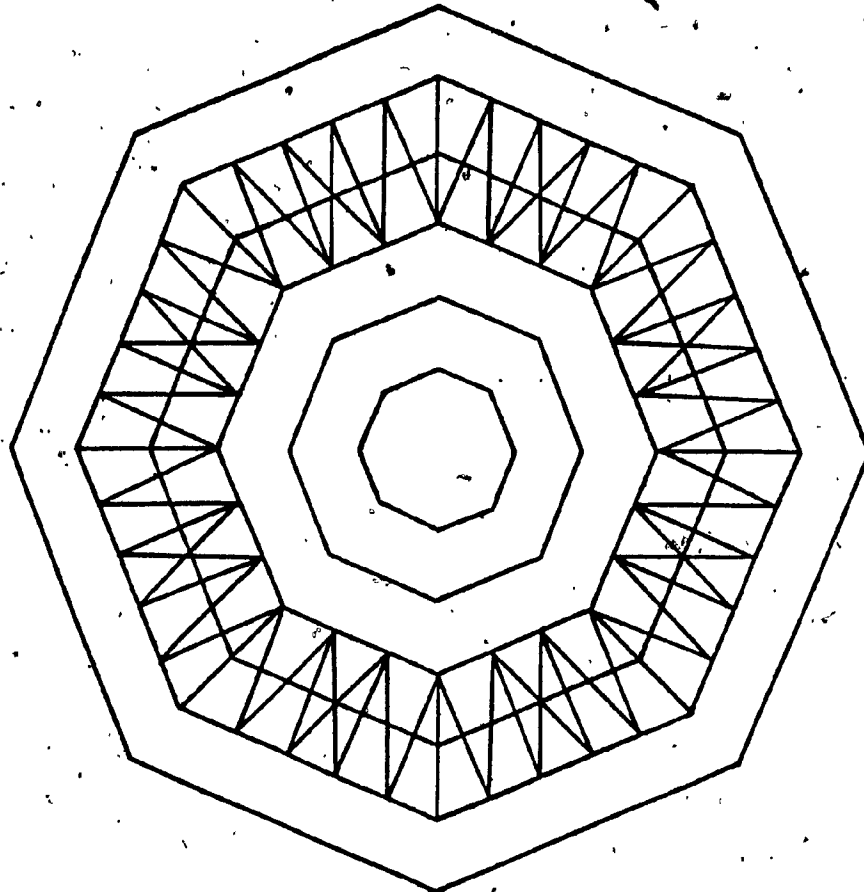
PLAN VIEW OF AN OCTOGONAL RING TRUSS, WITH SIX EQUALLY SPACED RINGS. THE INNERMOST PERIMETER BRACING TRUSS IS SHOWN IN ADDITION TO THE RINGS.
